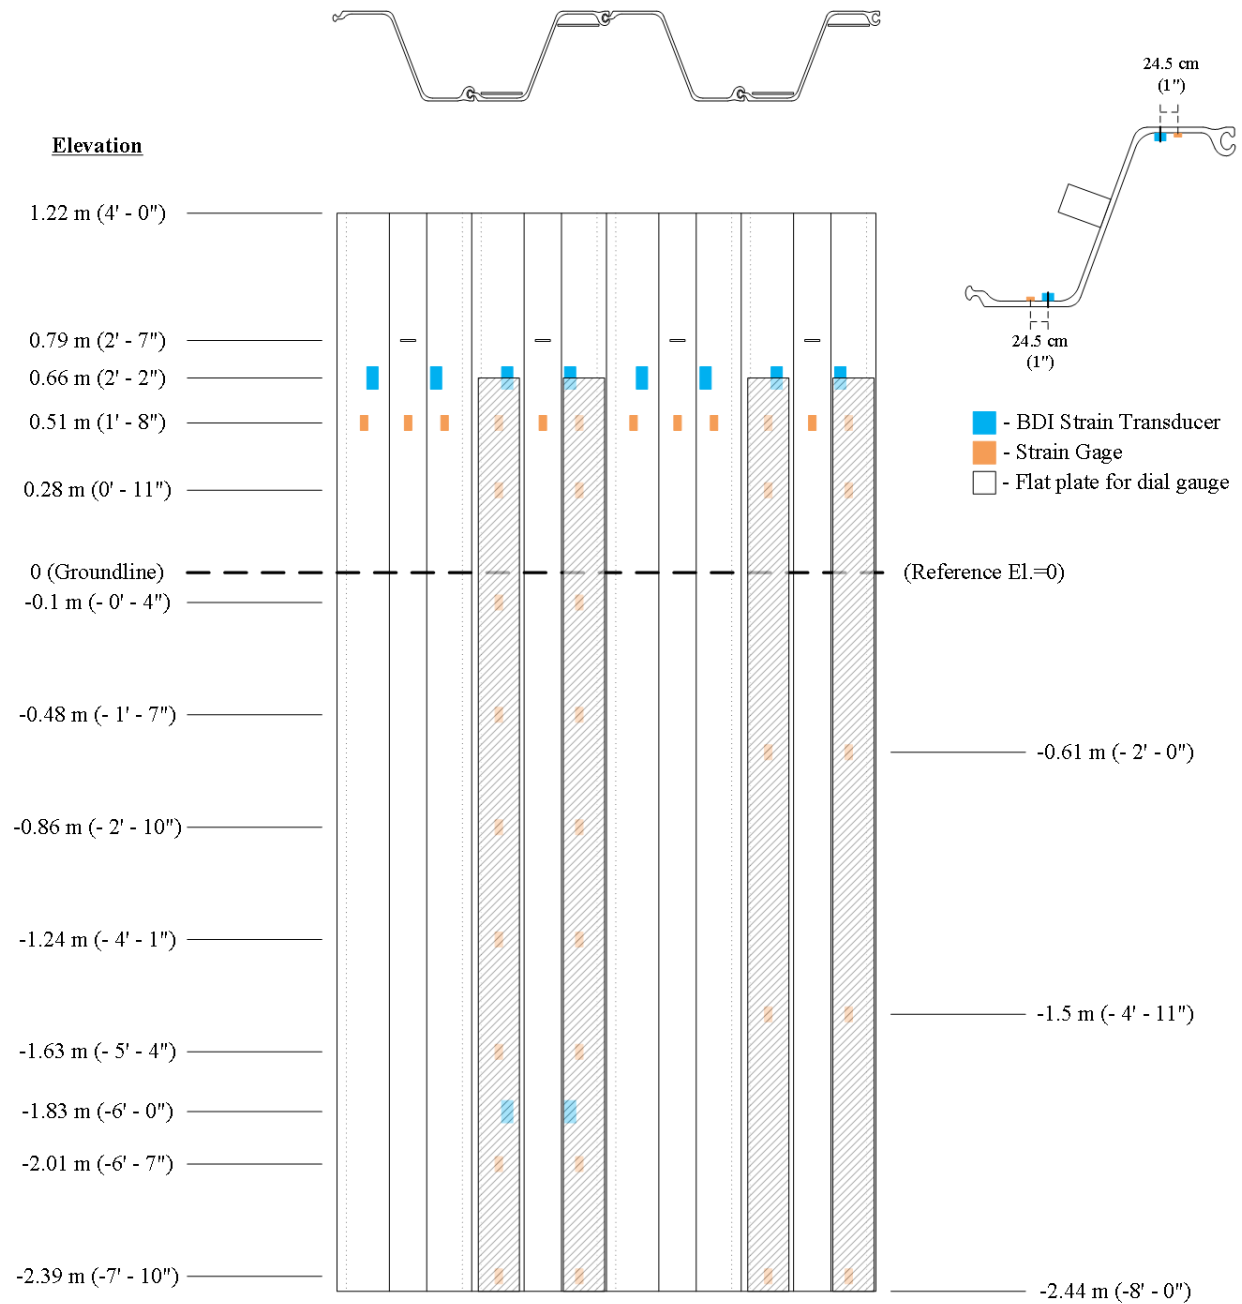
Layout of strain gages installed on the sheet pile walls (4 sections per wall).
